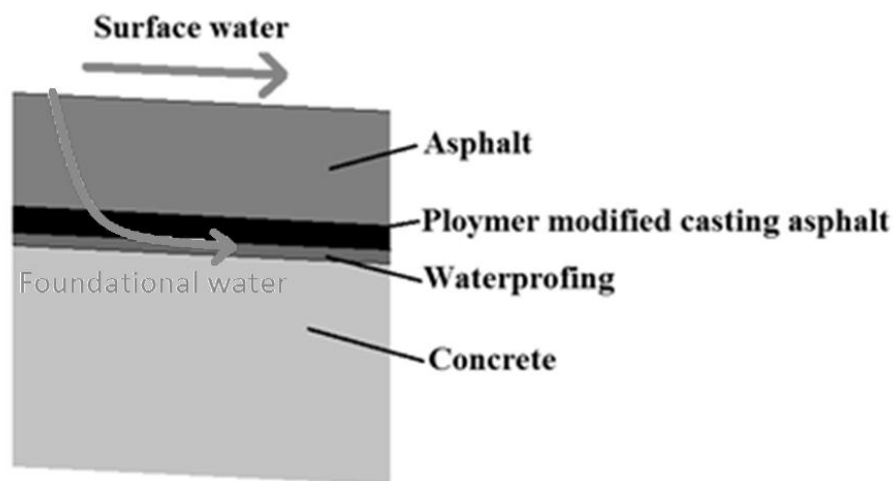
The differences between surface water and foundational water on bridge decks with concrete slabs
